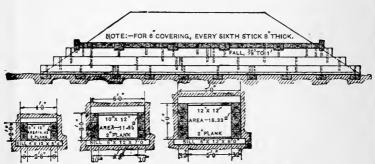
Standard Timber Box Culvert. C., M. & St. P. Ry. (Feb. 1889.)
